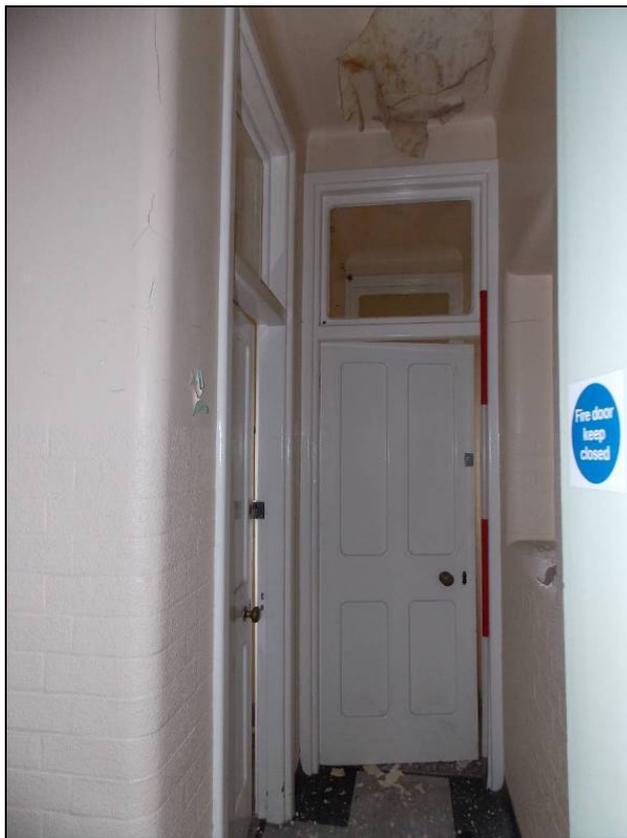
Original door to southern lavatory, looking east (scale 2m).
